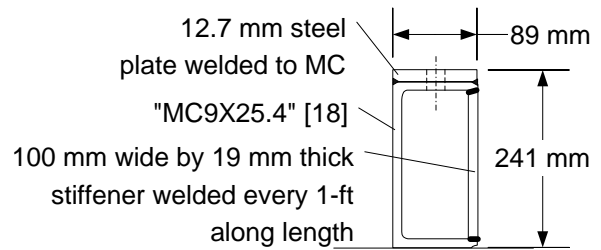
Steel “C” section used as the base for shear wall tests. The section is bolted to tubes, which are bolted to a concrete floor.
